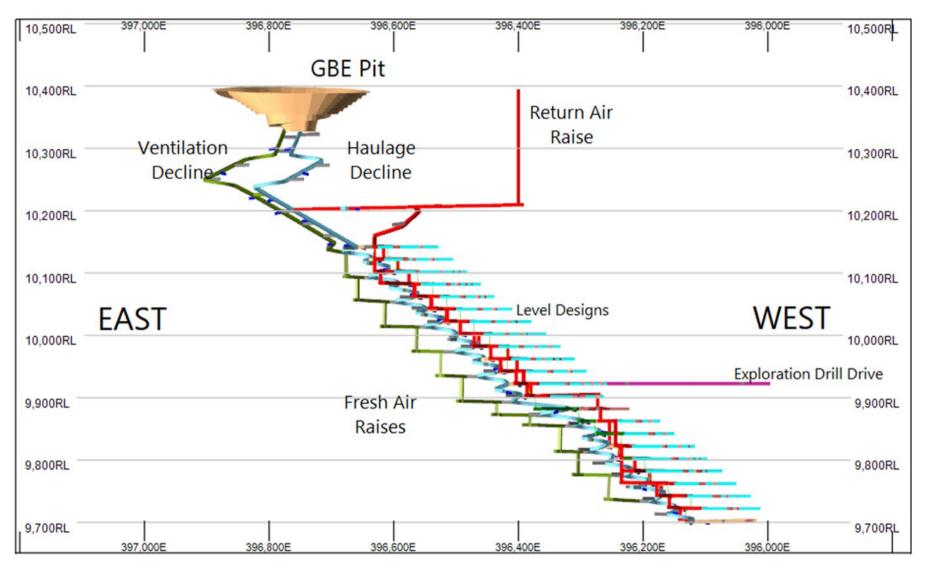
Overview of Bankan Underground Development Design – Looking South
